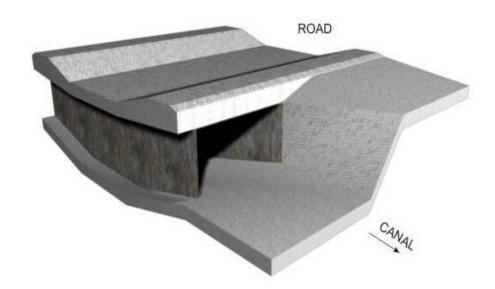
Inverted Syphon below roads showing rectangular section. Circular section also possible
